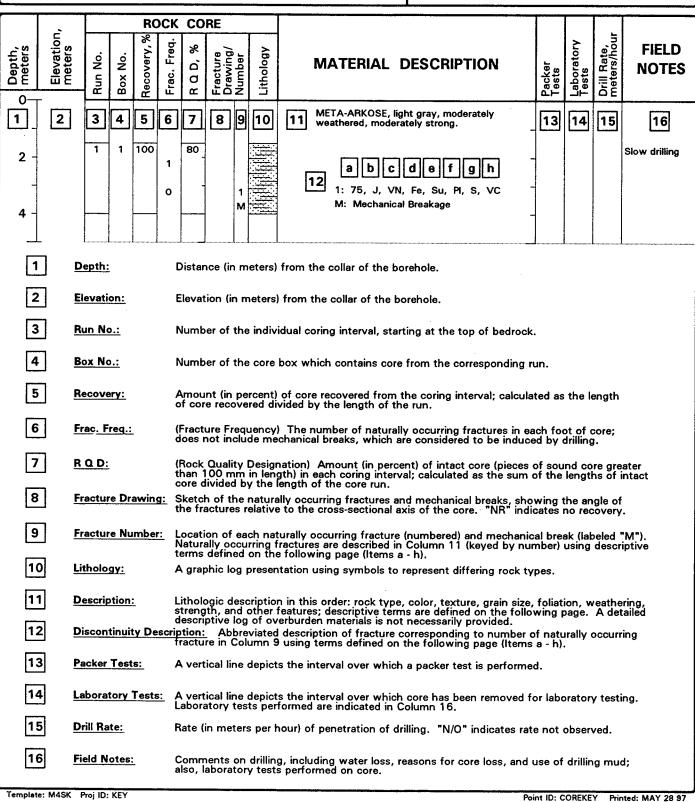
Proposed Key to Core Boring Log (Continued on Page 4-8).
